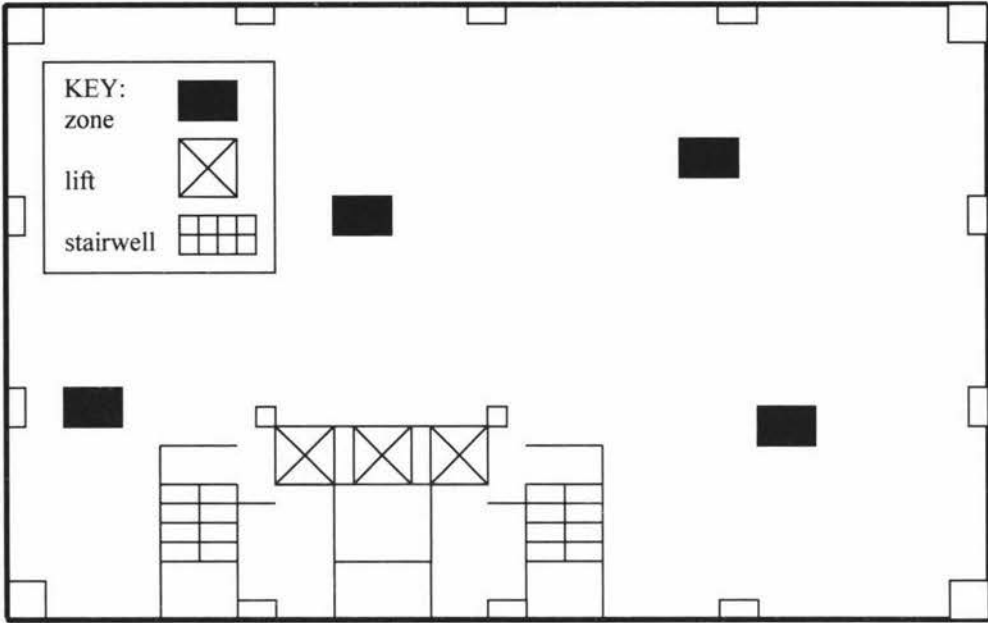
Floor plan of building one outlining the sampling zones selected on all three levels (not to scale).
